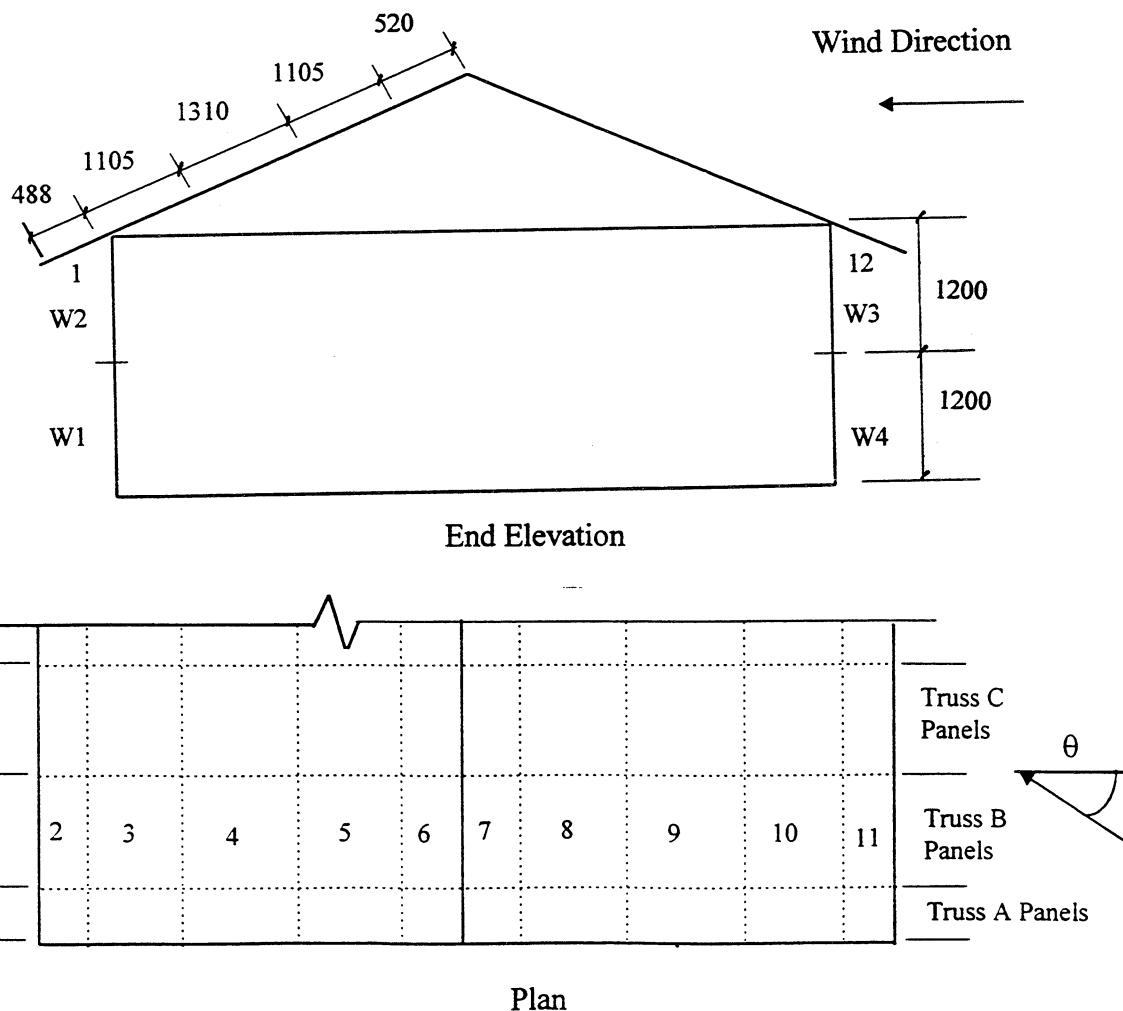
Nu-Steel Building Roof and Wall Panel Areas All dimensions in mm
